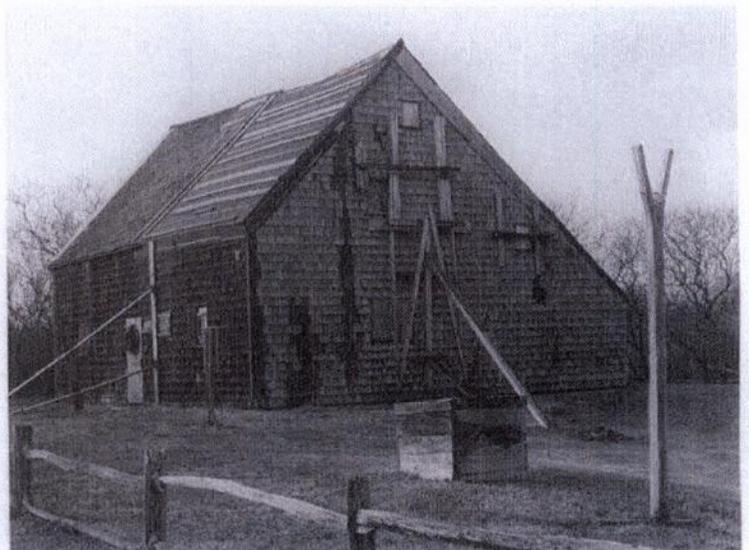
Buildings seriously damaged by storms or deterioration may need to be braced before architectural evaluations can be made. Jethro Coffin House. Photo: John Milner Architects.
